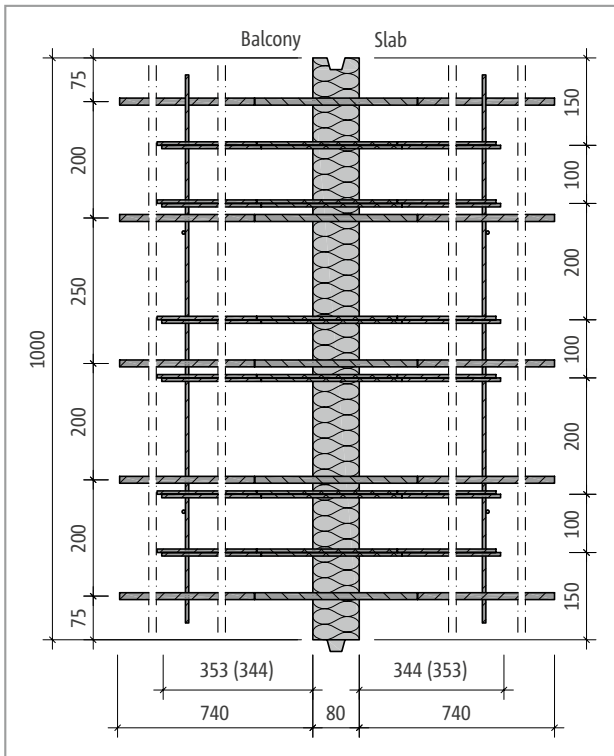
Schöck Isokorb® T type D-MM2-VV1: Layout
